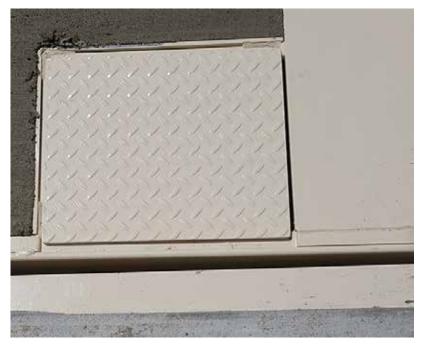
Installed access plate on 8-inch beam concrete deck scale
